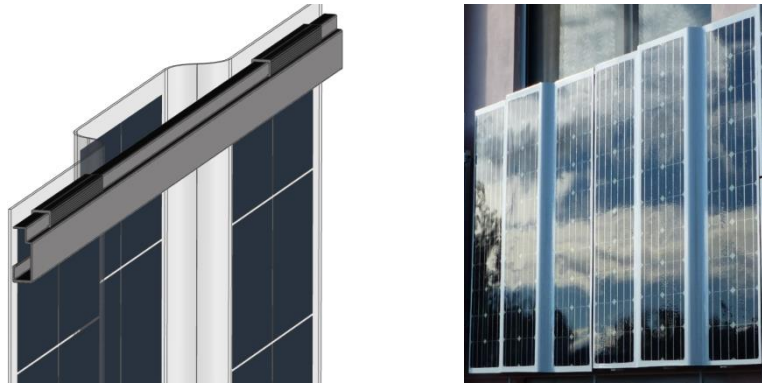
Ventilated façade mounting solution and profiles system (left) and final element as manufactured (right)
